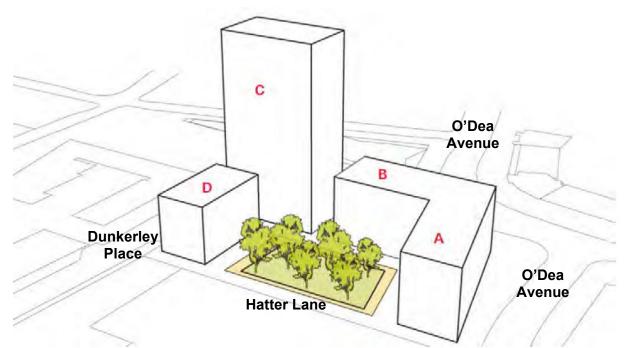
Massing Diagram illustrating general arrangement of building envelopes around communal open space.
